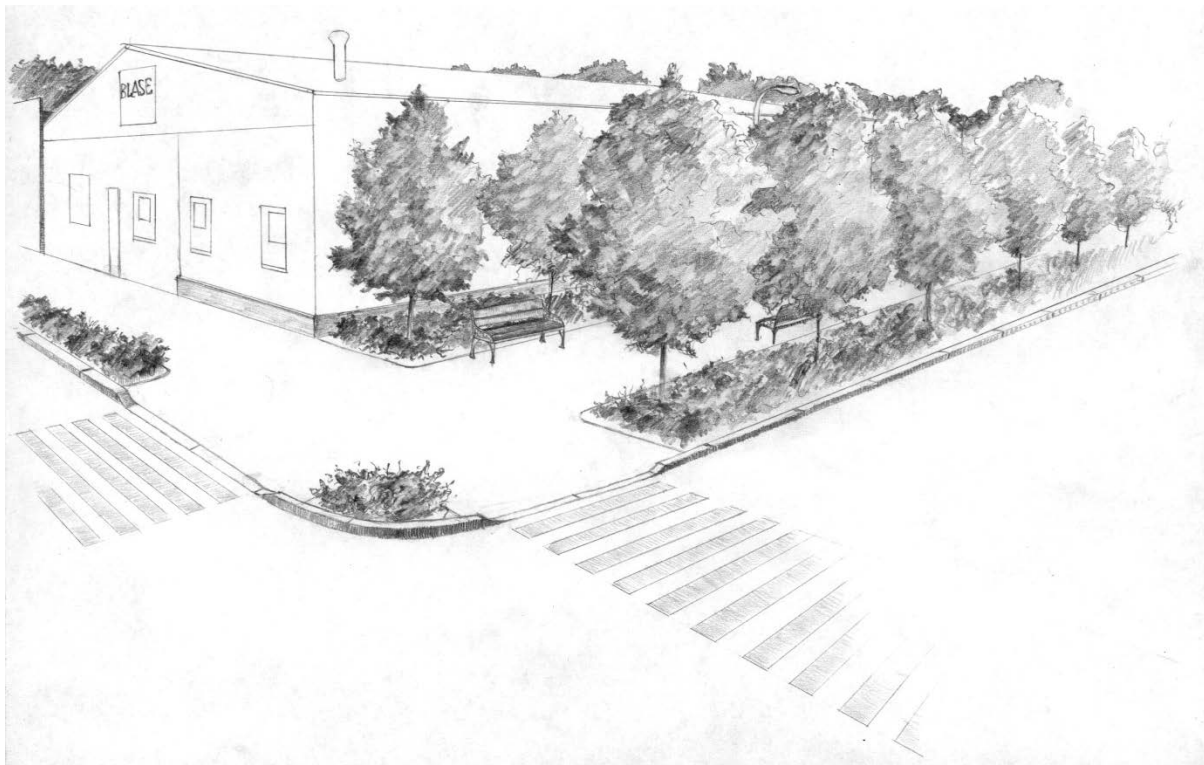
This location on West 1st Street could easily become a haven for pedestrians through the incorporation of a paved sidewalk and a double row of small street trees and planting beds.
